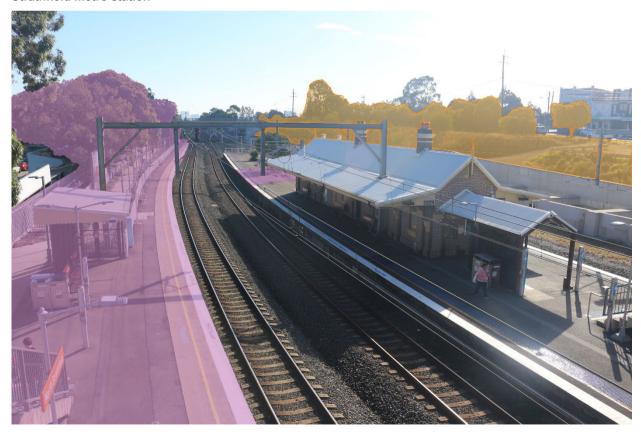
Existing view from viewpoint 5 (view north-east from North Strathfield Station footbridge) – North Strathfield metro station. Extent of previous vegetation removal as part the work carried out under the previous Sydney Metro West planning application is shown in orange. Additional footprint for this proposal is shown in purple
